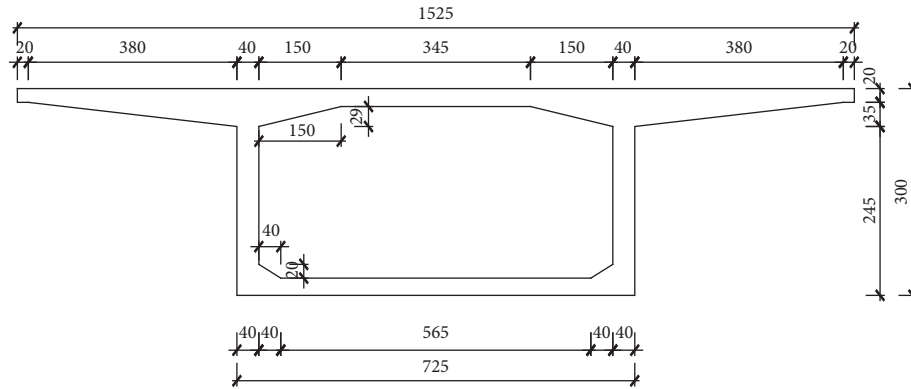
Midspan cross section of 5 × 50 m simple-continuous box girder of Donghai Bridge (mm).
